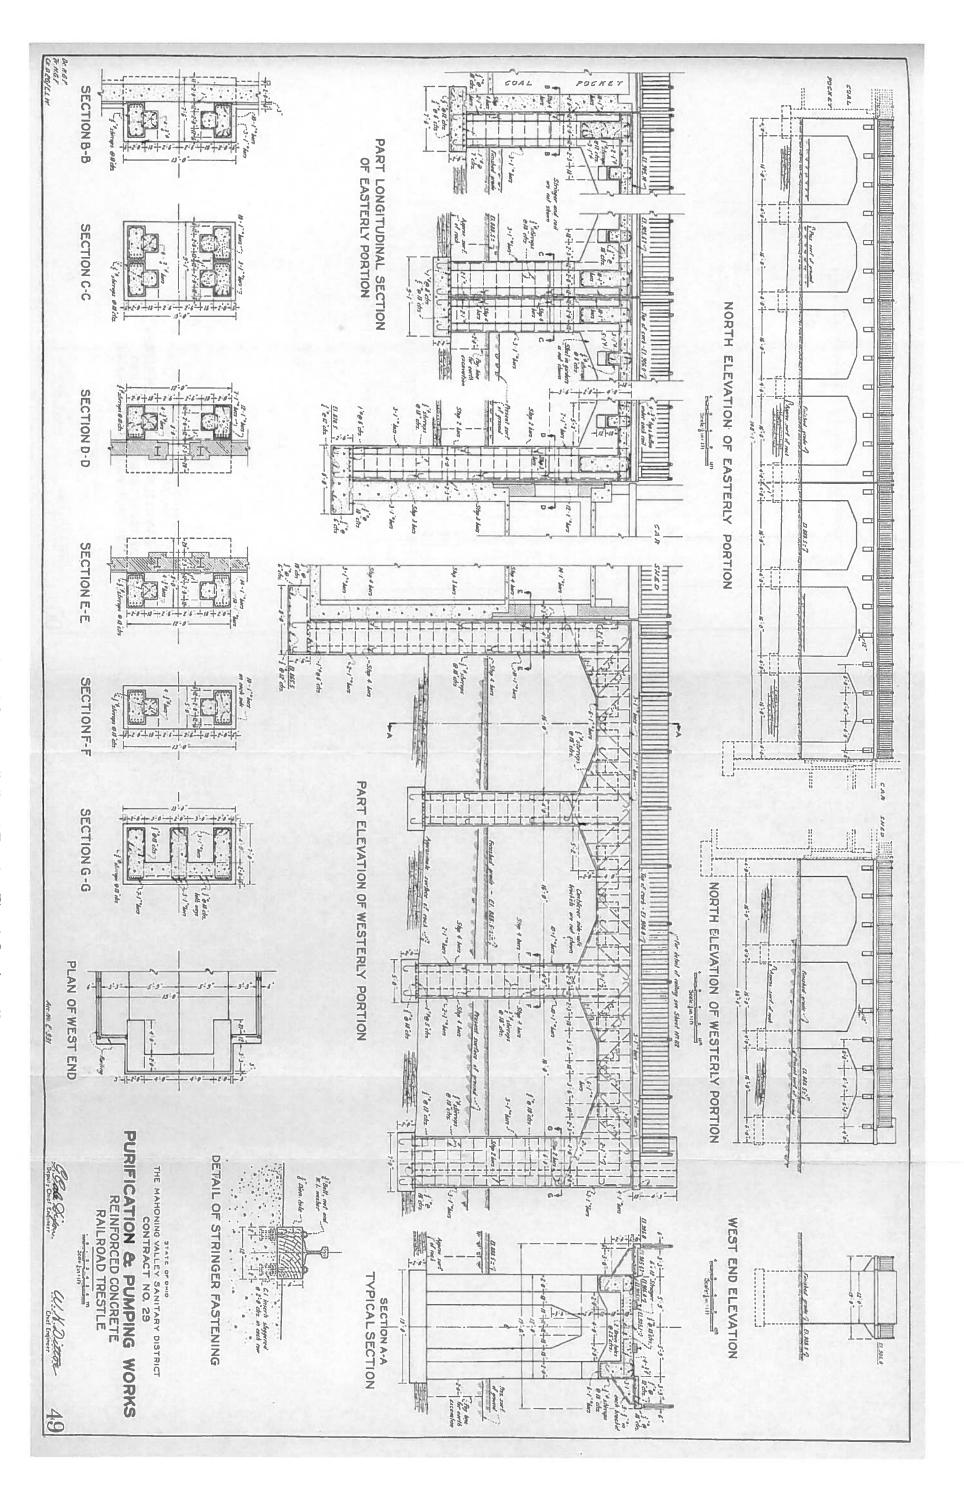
Dwg. 49 - Reinforced Concrete Railroad Trestle - Elev & Sections.tif
